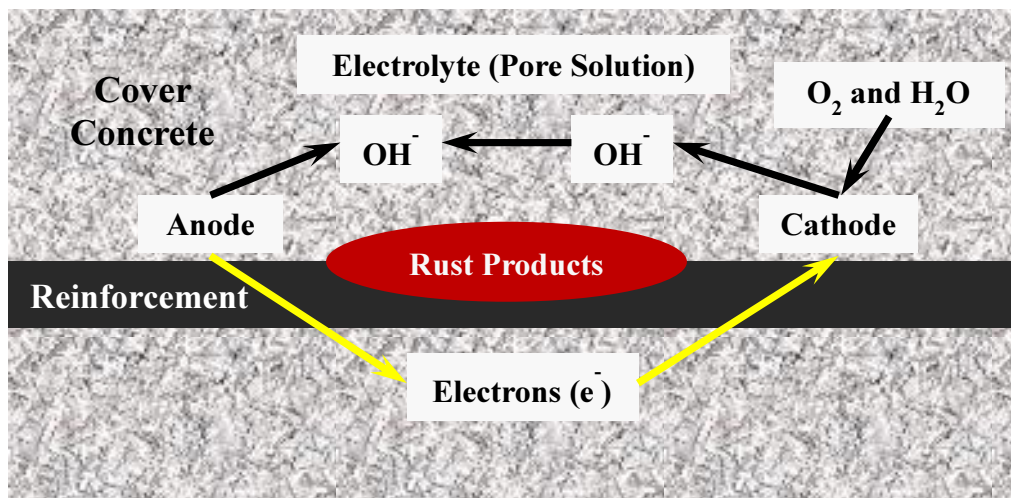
Corrosion mechanism of steel reinforcement inside concrete
